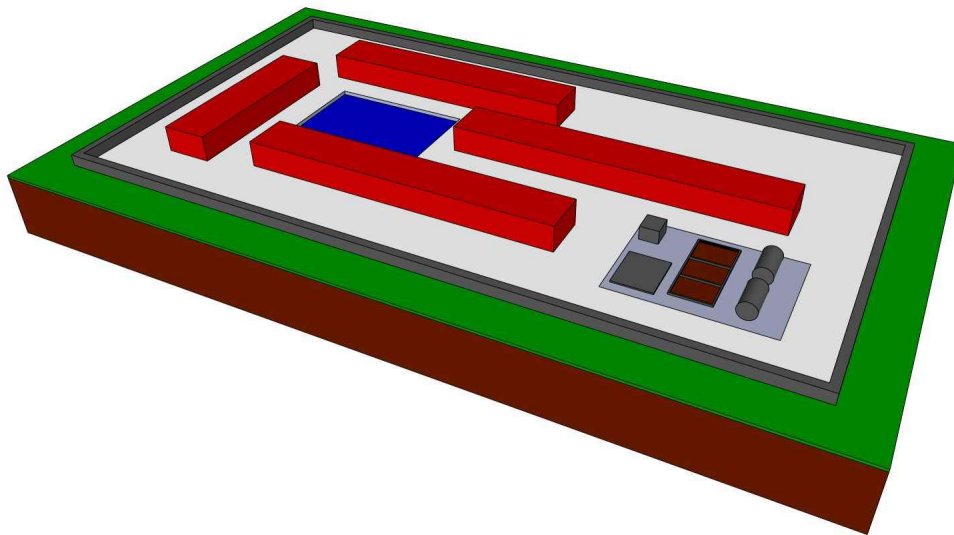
3D schematisation of the gravity wall around the Blau Arenal Hotel and the waste water treatment plant
